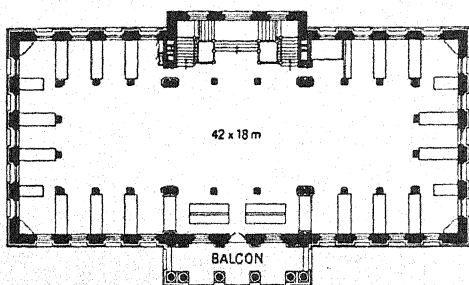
Chicago Academy of Sciences. Plan of first floor.
